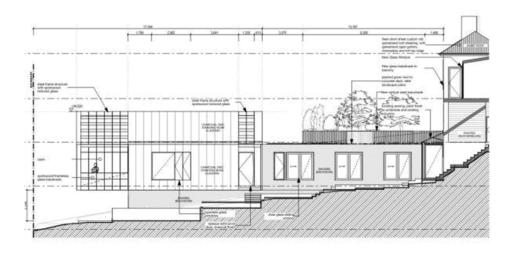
Part of the proposed western (Wilmot Street) elevation showing the main dwelling
